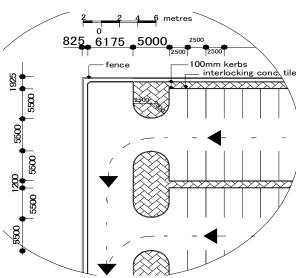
Infrastructural Detail at A. Plan. Source: author's design
